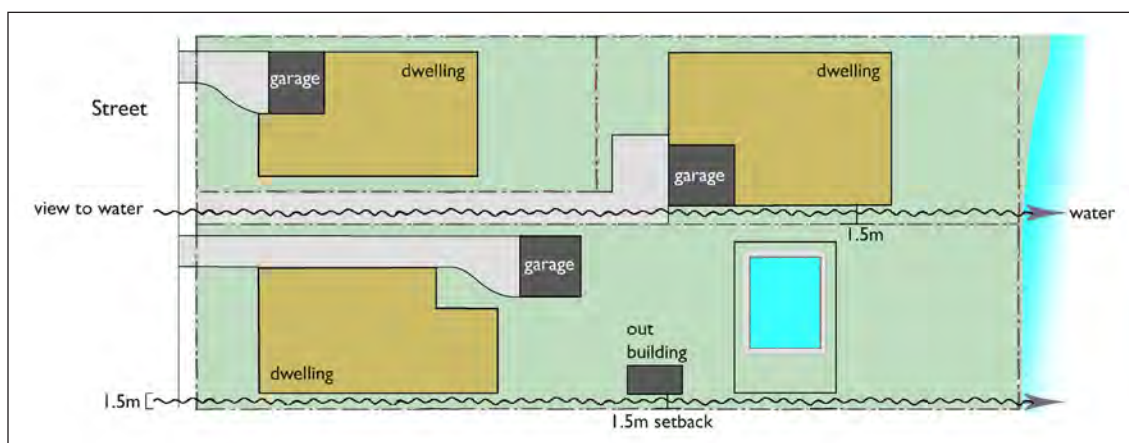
Views from public places to the water are to be provided between buildings along side boundaries. Fencing, landscaping elements, garages and outbuildings are not to obstruct the view.
